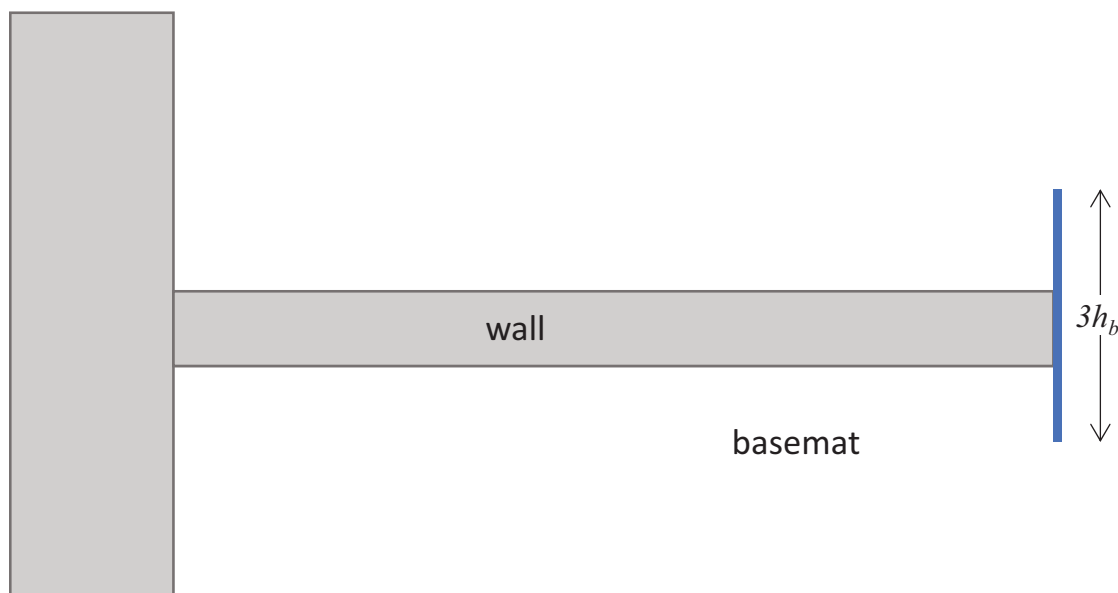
Out-of-plane forces in foundation basemat due to wall rockingFigure 8-9 Section cuts for one-way and two-way shear in basemat subject to wall overturning
